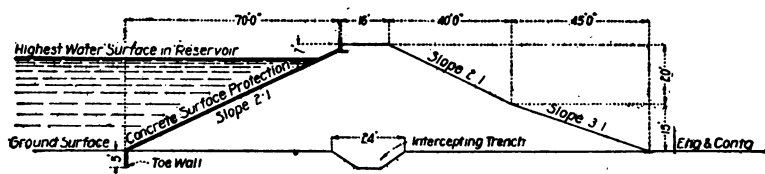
Typical Section of Prewitt Reservoir Embankment.
